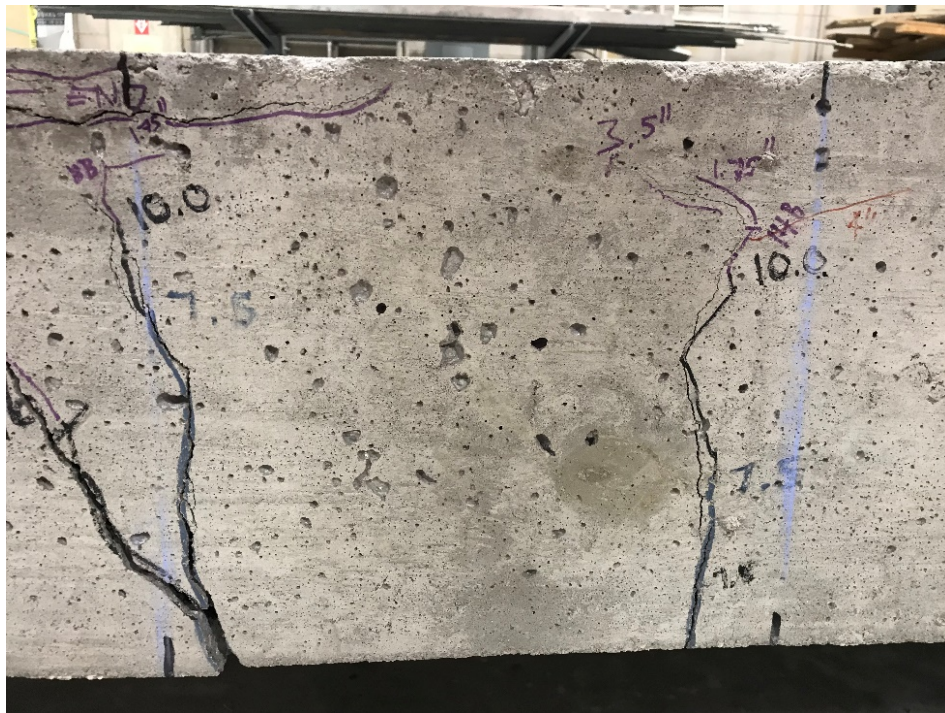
Propagation of cracks occurring near midspan of approach slab, Test 2.
